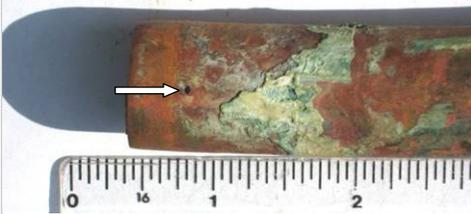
Localized (pitting) corrosion resulting in pinhole leak near a soldered joint
